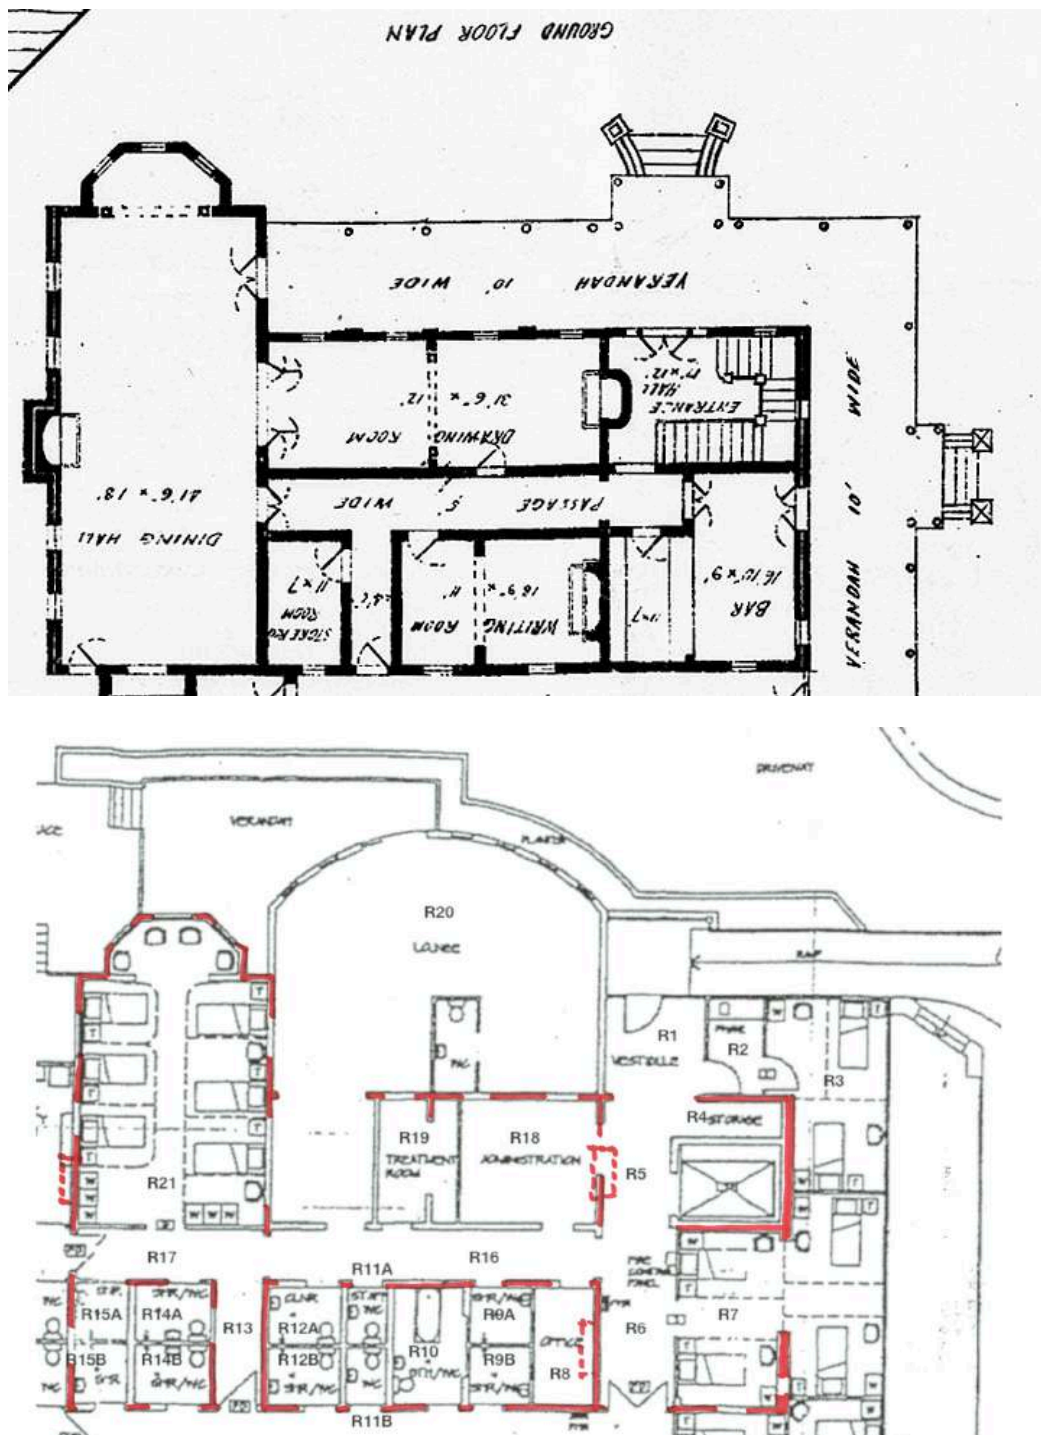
Original plan and current ground floor plan showing remnant walls. The eastern verandah retains its cast iron columns from both the original hotel and the southern wing extension.
